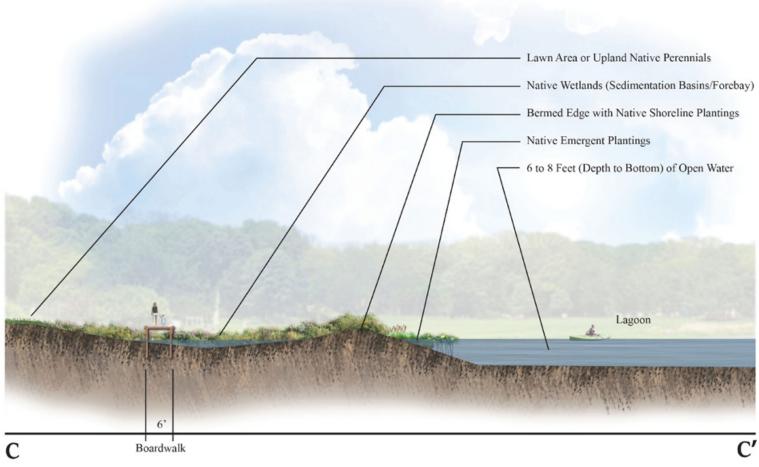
Native Plantings in Stormwater Basin (Olbrich Park, Madison, WI)
